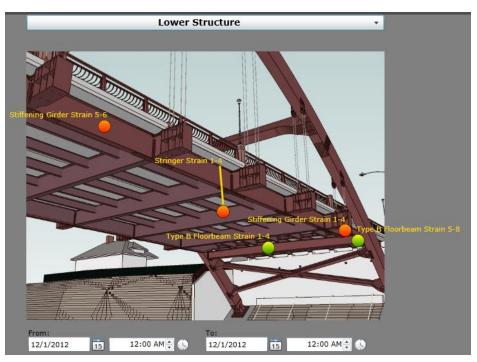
Strain sensor locations for the stiffening girder, floor beam, and stringer on the lower portion of the bridge superstructure
